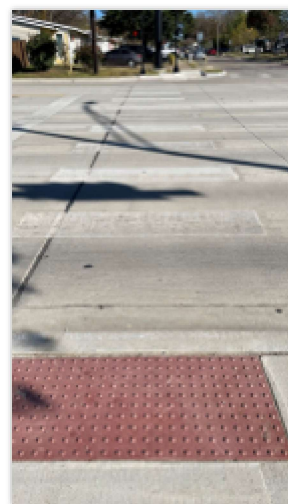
Lovers Ln to Blanton sidewalk faded crosswalk
